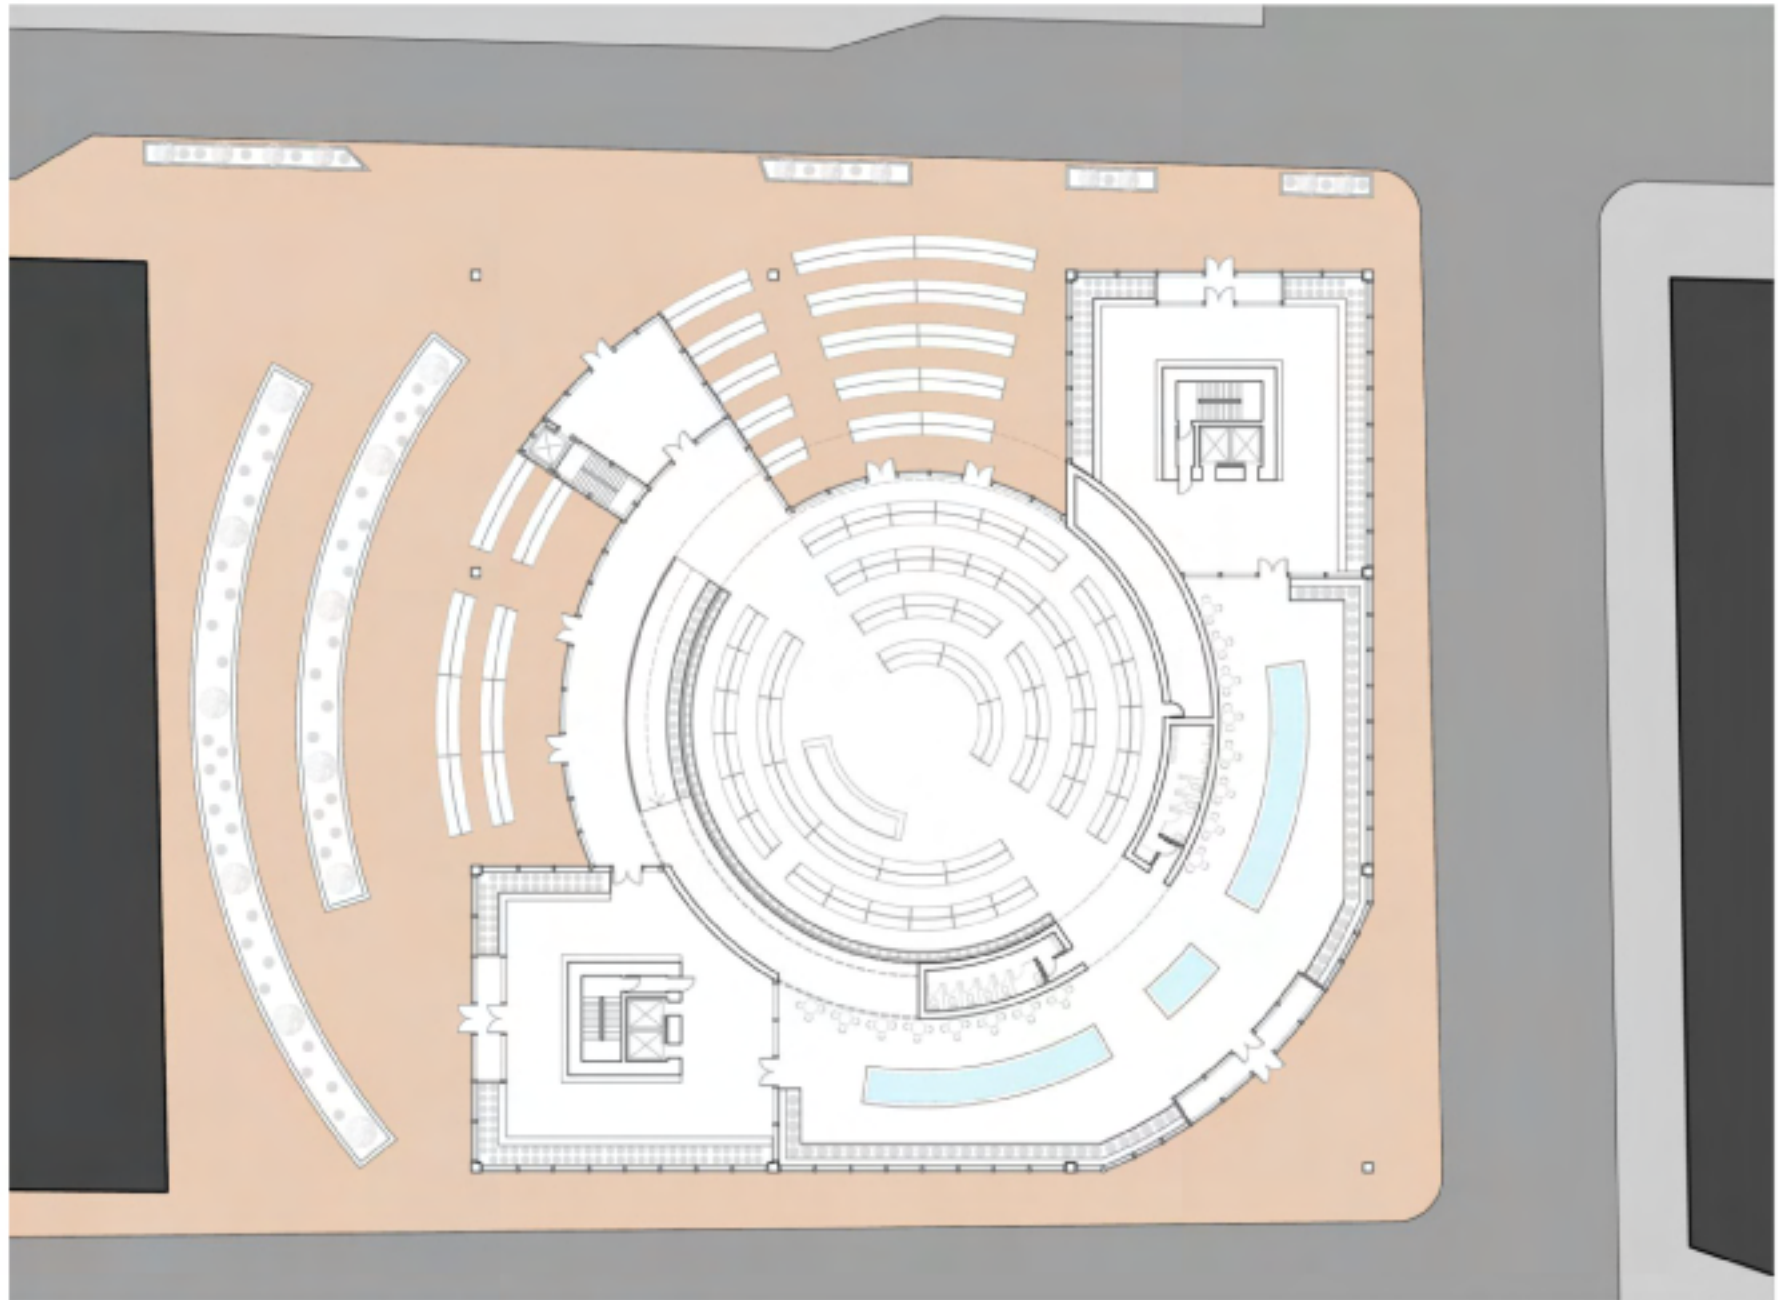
Ground Floor Plan [Created using AutoCAD and Photoshop]
